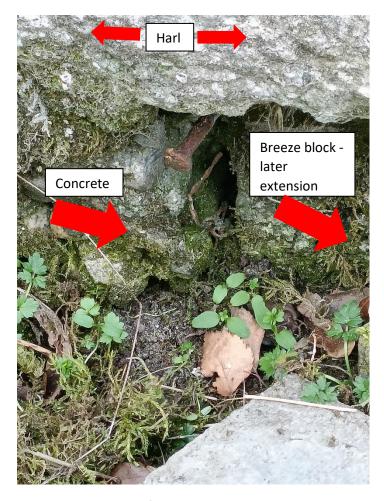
Evidence of concrete wall construction at junction between original rear extension and later extension on northern elevation
